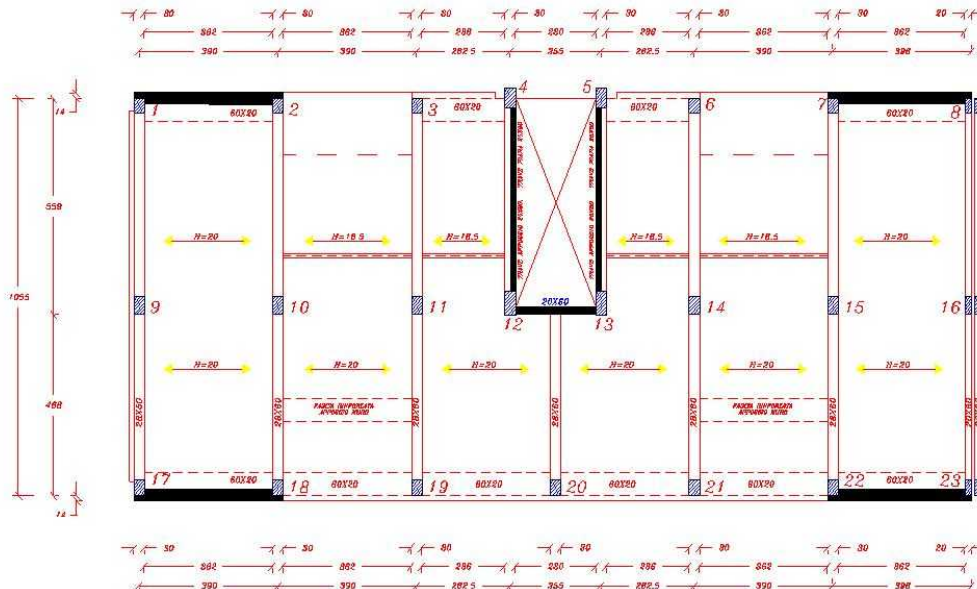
B: Seismic Strengthening - Floor Plan of a Strengthened Building
